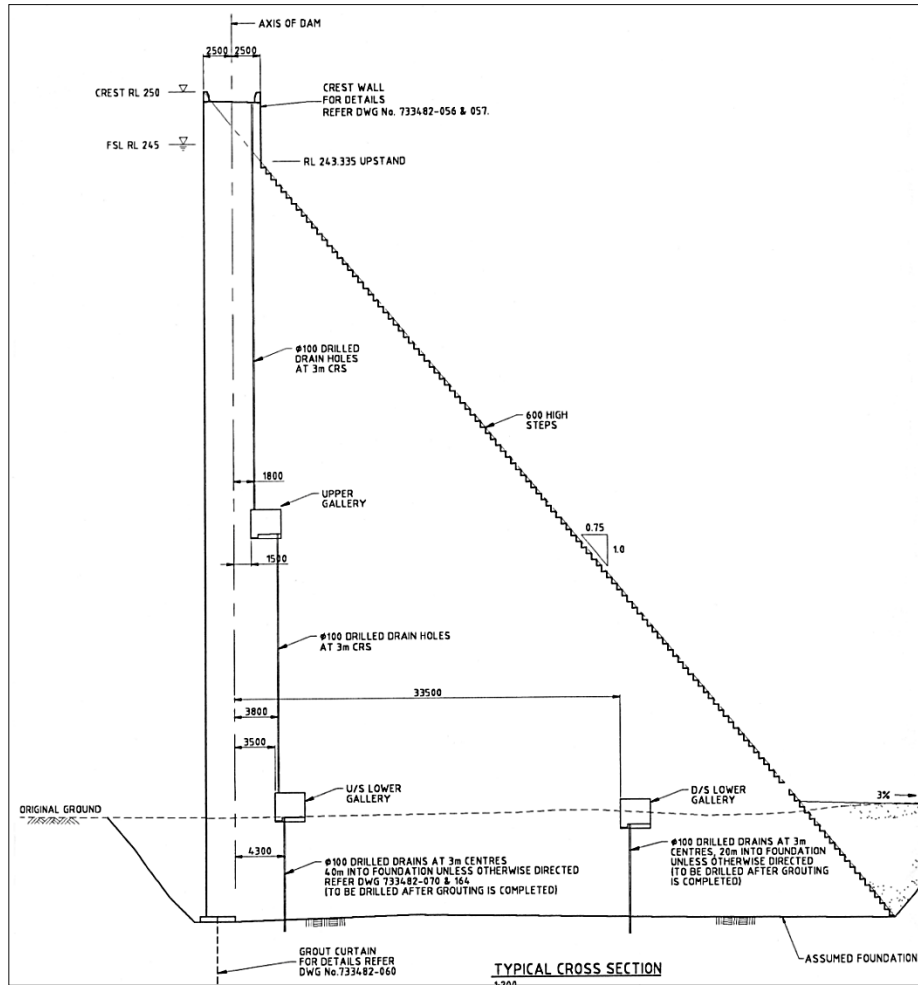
Typical Cross Section of the Dam (SUNGAI Kinta RCC dam 2002)
